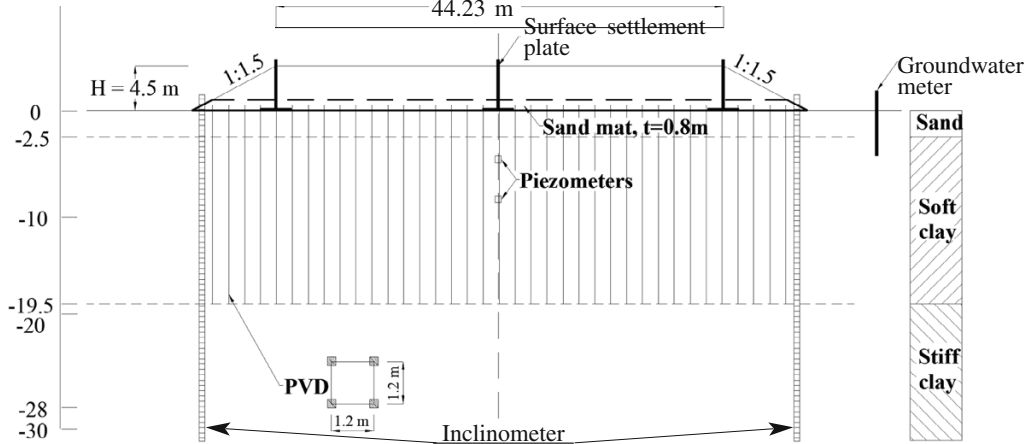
Typical layout of PVDs and field instrumentation with embankment (Sta. 76+400).
